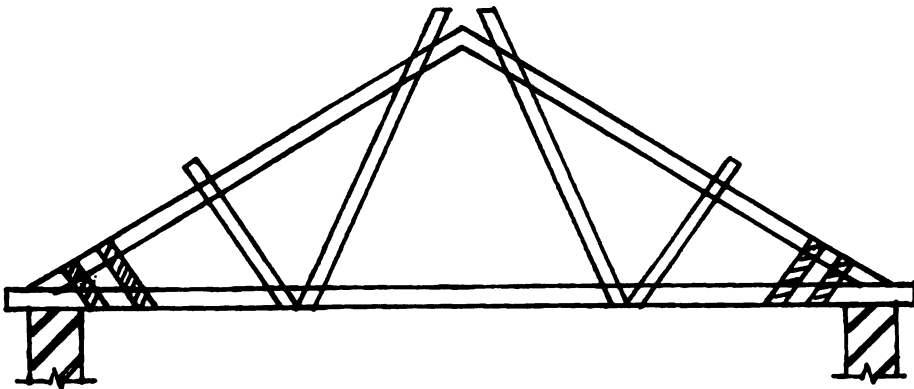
Laminated roof made from wooden planks nailed together (members extended for seating of purlins).
